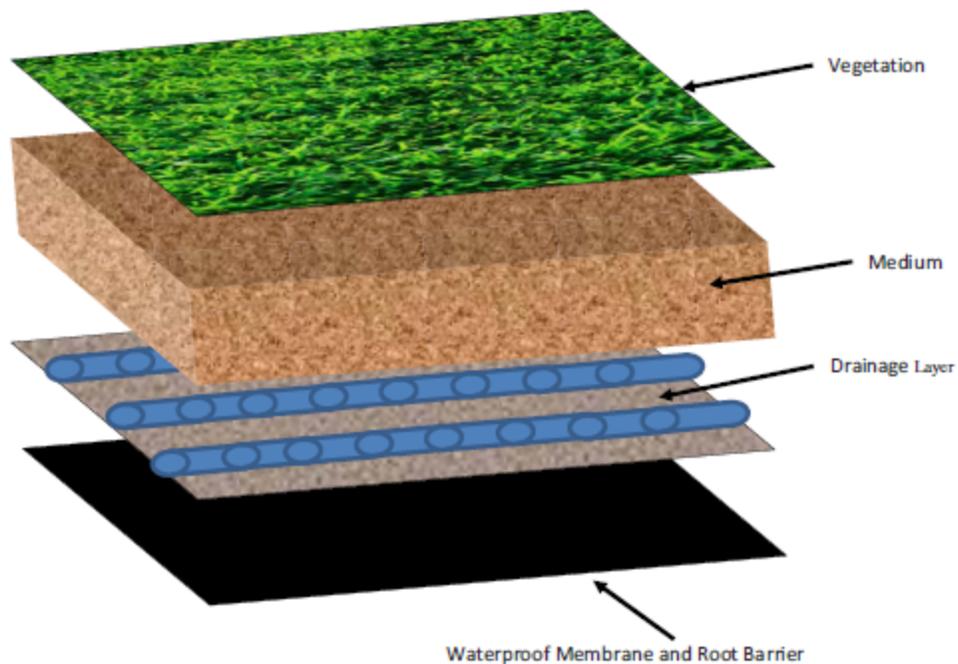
Typical Green Roof Profile (She and Pang, 2010)
